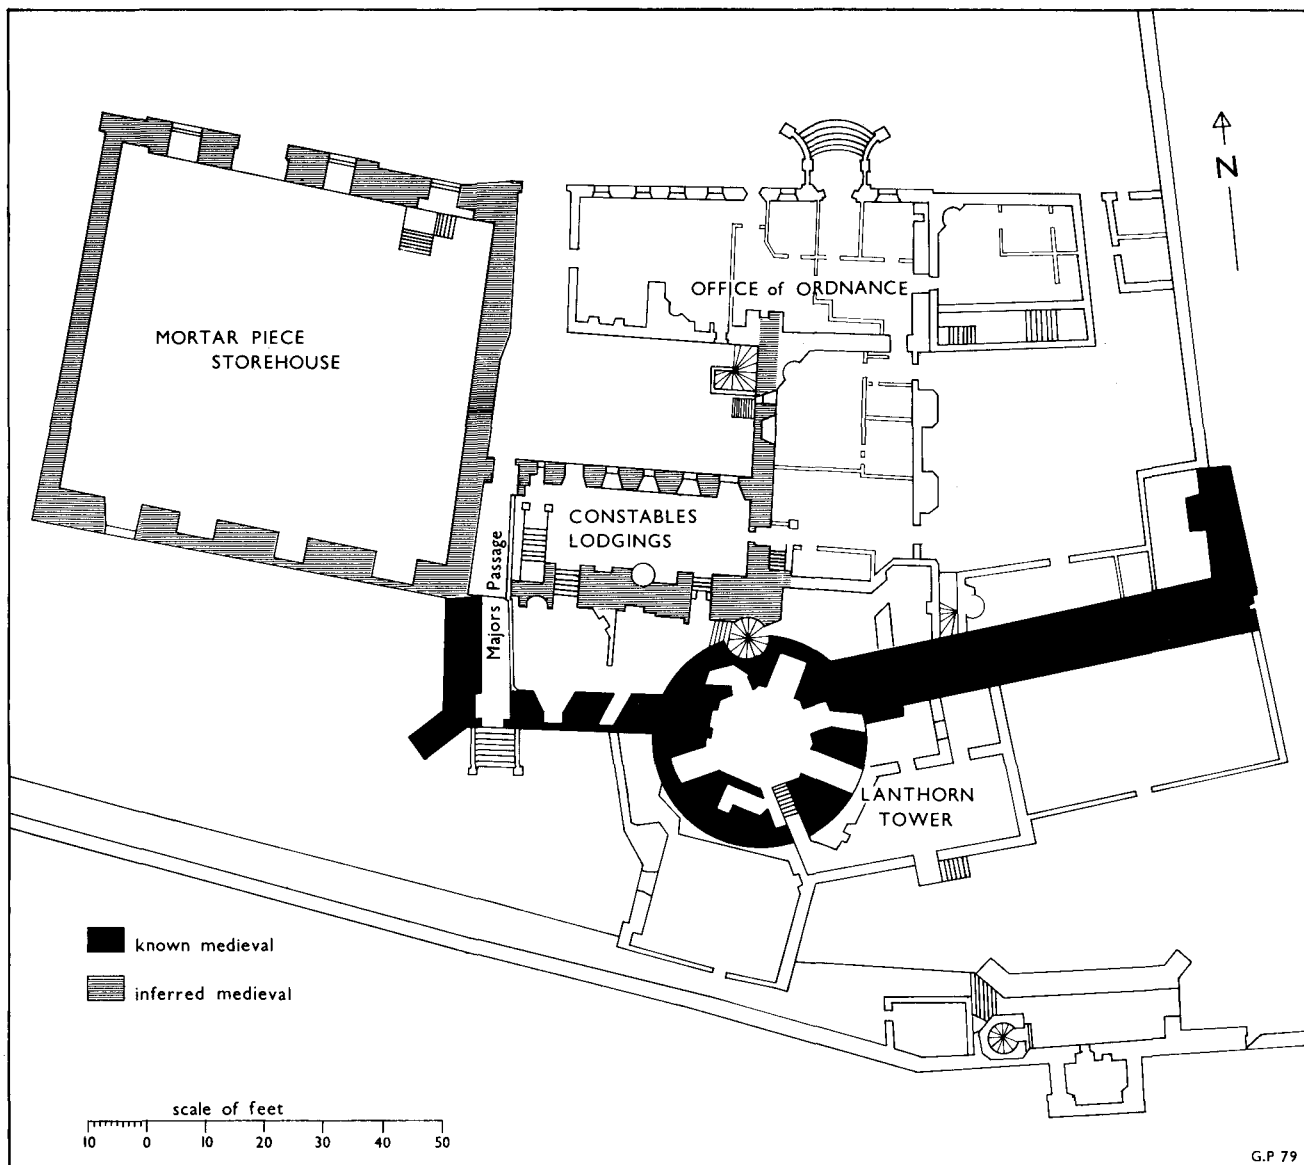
Tower of London: South-east corner of Inmost Ward showing building lay-out after reconstruction; redrawn from a plan of 1731.
